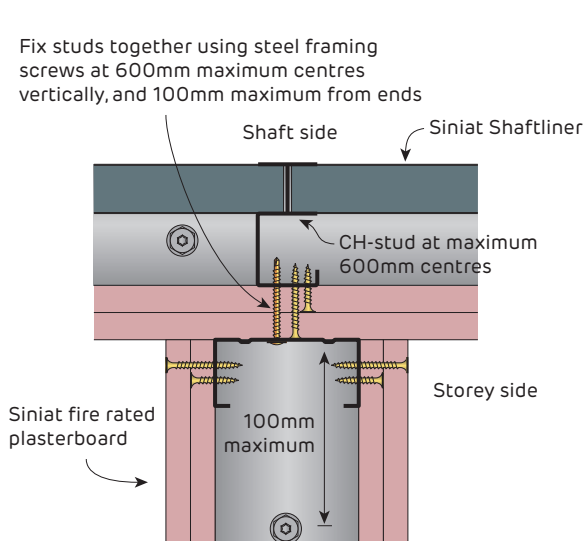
Shaft Wall to Internal Partition Corner
